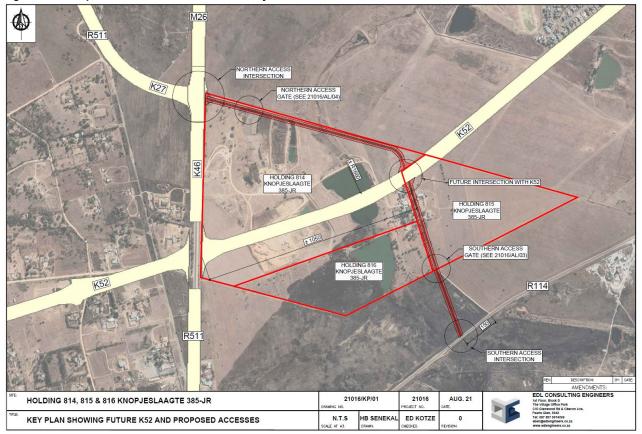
Key Plan Showing Future K52 and Proposed Accesses
